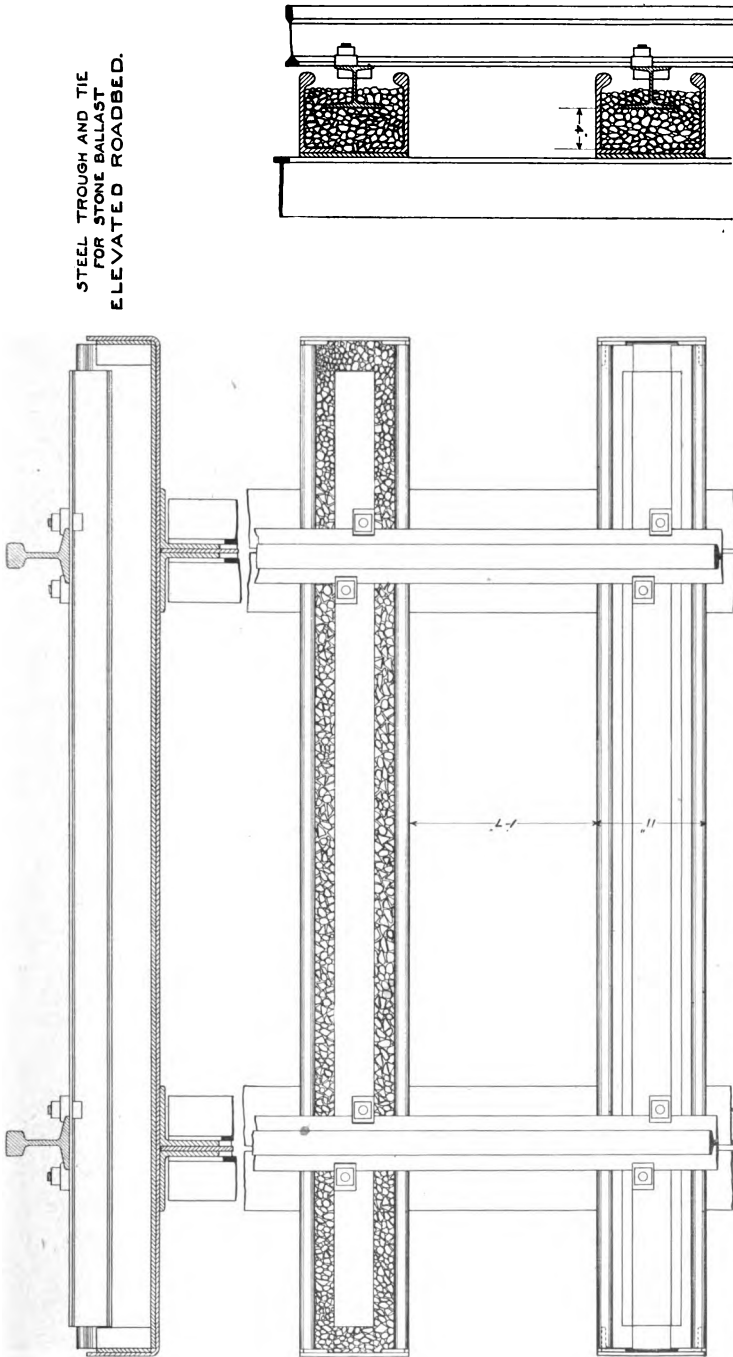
Suggested Type of Elevated Roadbed Construction with Steel Cross Troughs. Steel Ties on Broken-Stone Ballast. For Noise Deadening without cutting off all overhead Light from the Street. Plan, Longitudinal Section through trough, and cross-section. Ballast not shown in longitudinal section.
